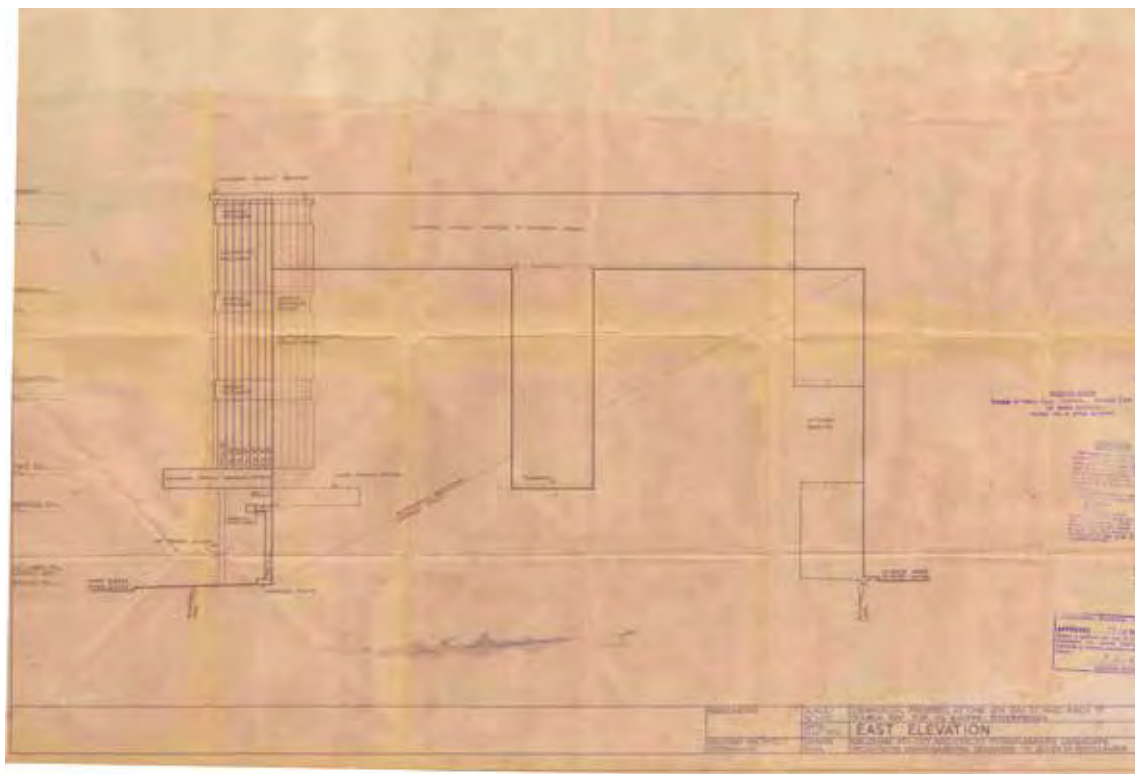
| *The east elevation of the Gruzman design. (Source: BA 1546/1971)
